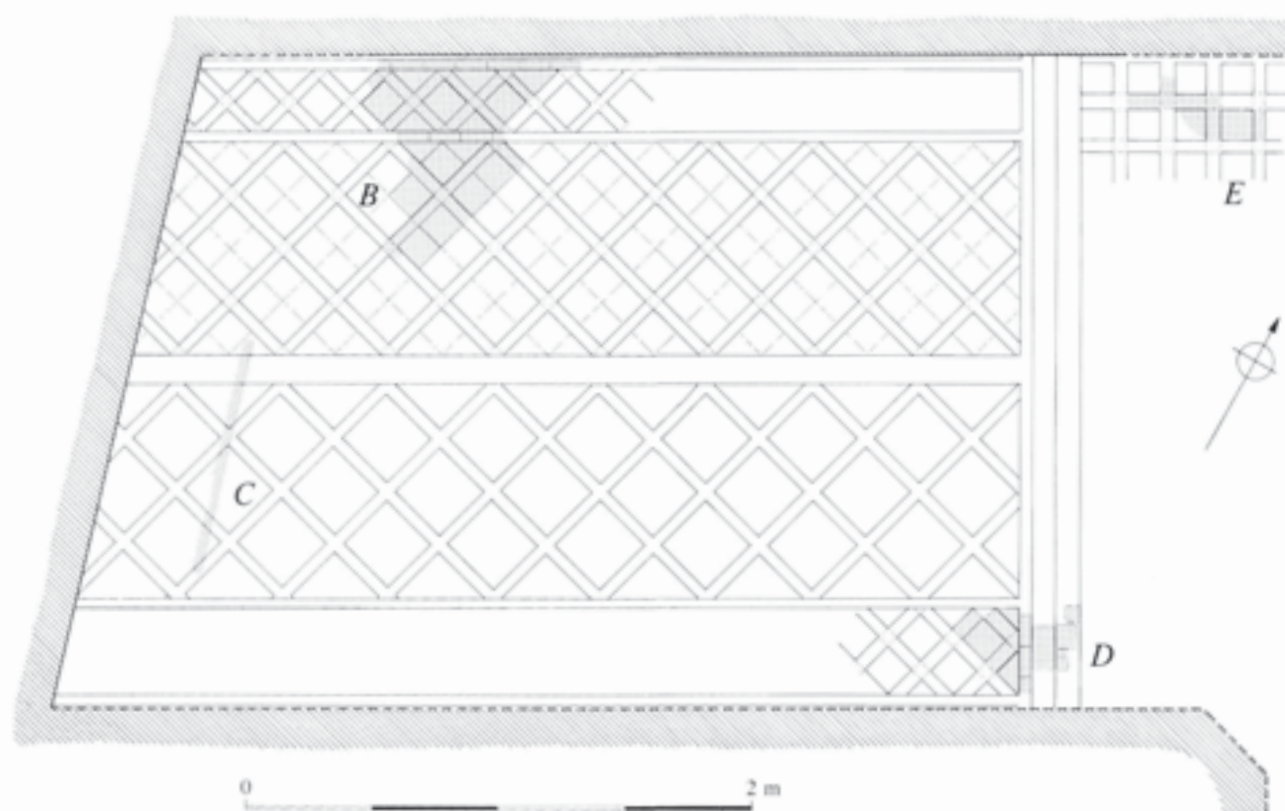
Reconstructed outline of the tile pavement at the west end of the north aisle of the Lady Chapel (incorporating areas B–E). Scale 1:30
